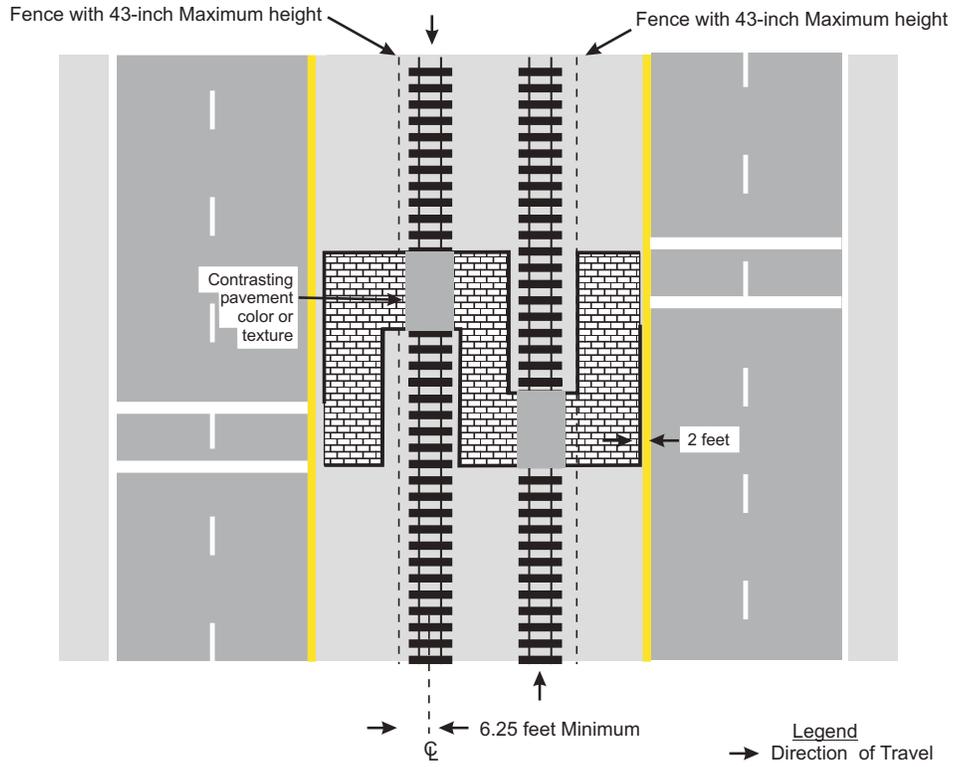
C-10. Examples of Pedestrian Barrier Installation at an Offset Non-Intersection Grade Crossing
